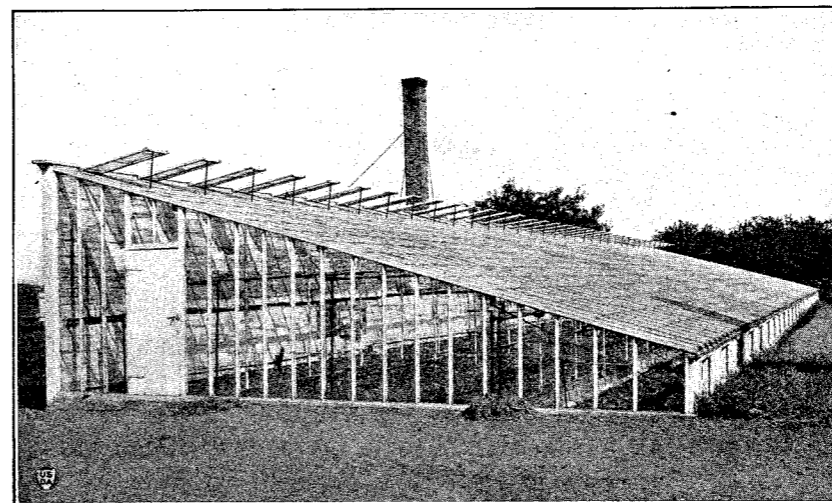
Lean-to house with two or more walks, which may be of any desired width. Instead of the house shown here being built against an existing wall, it was constructed with one wooden wall.
